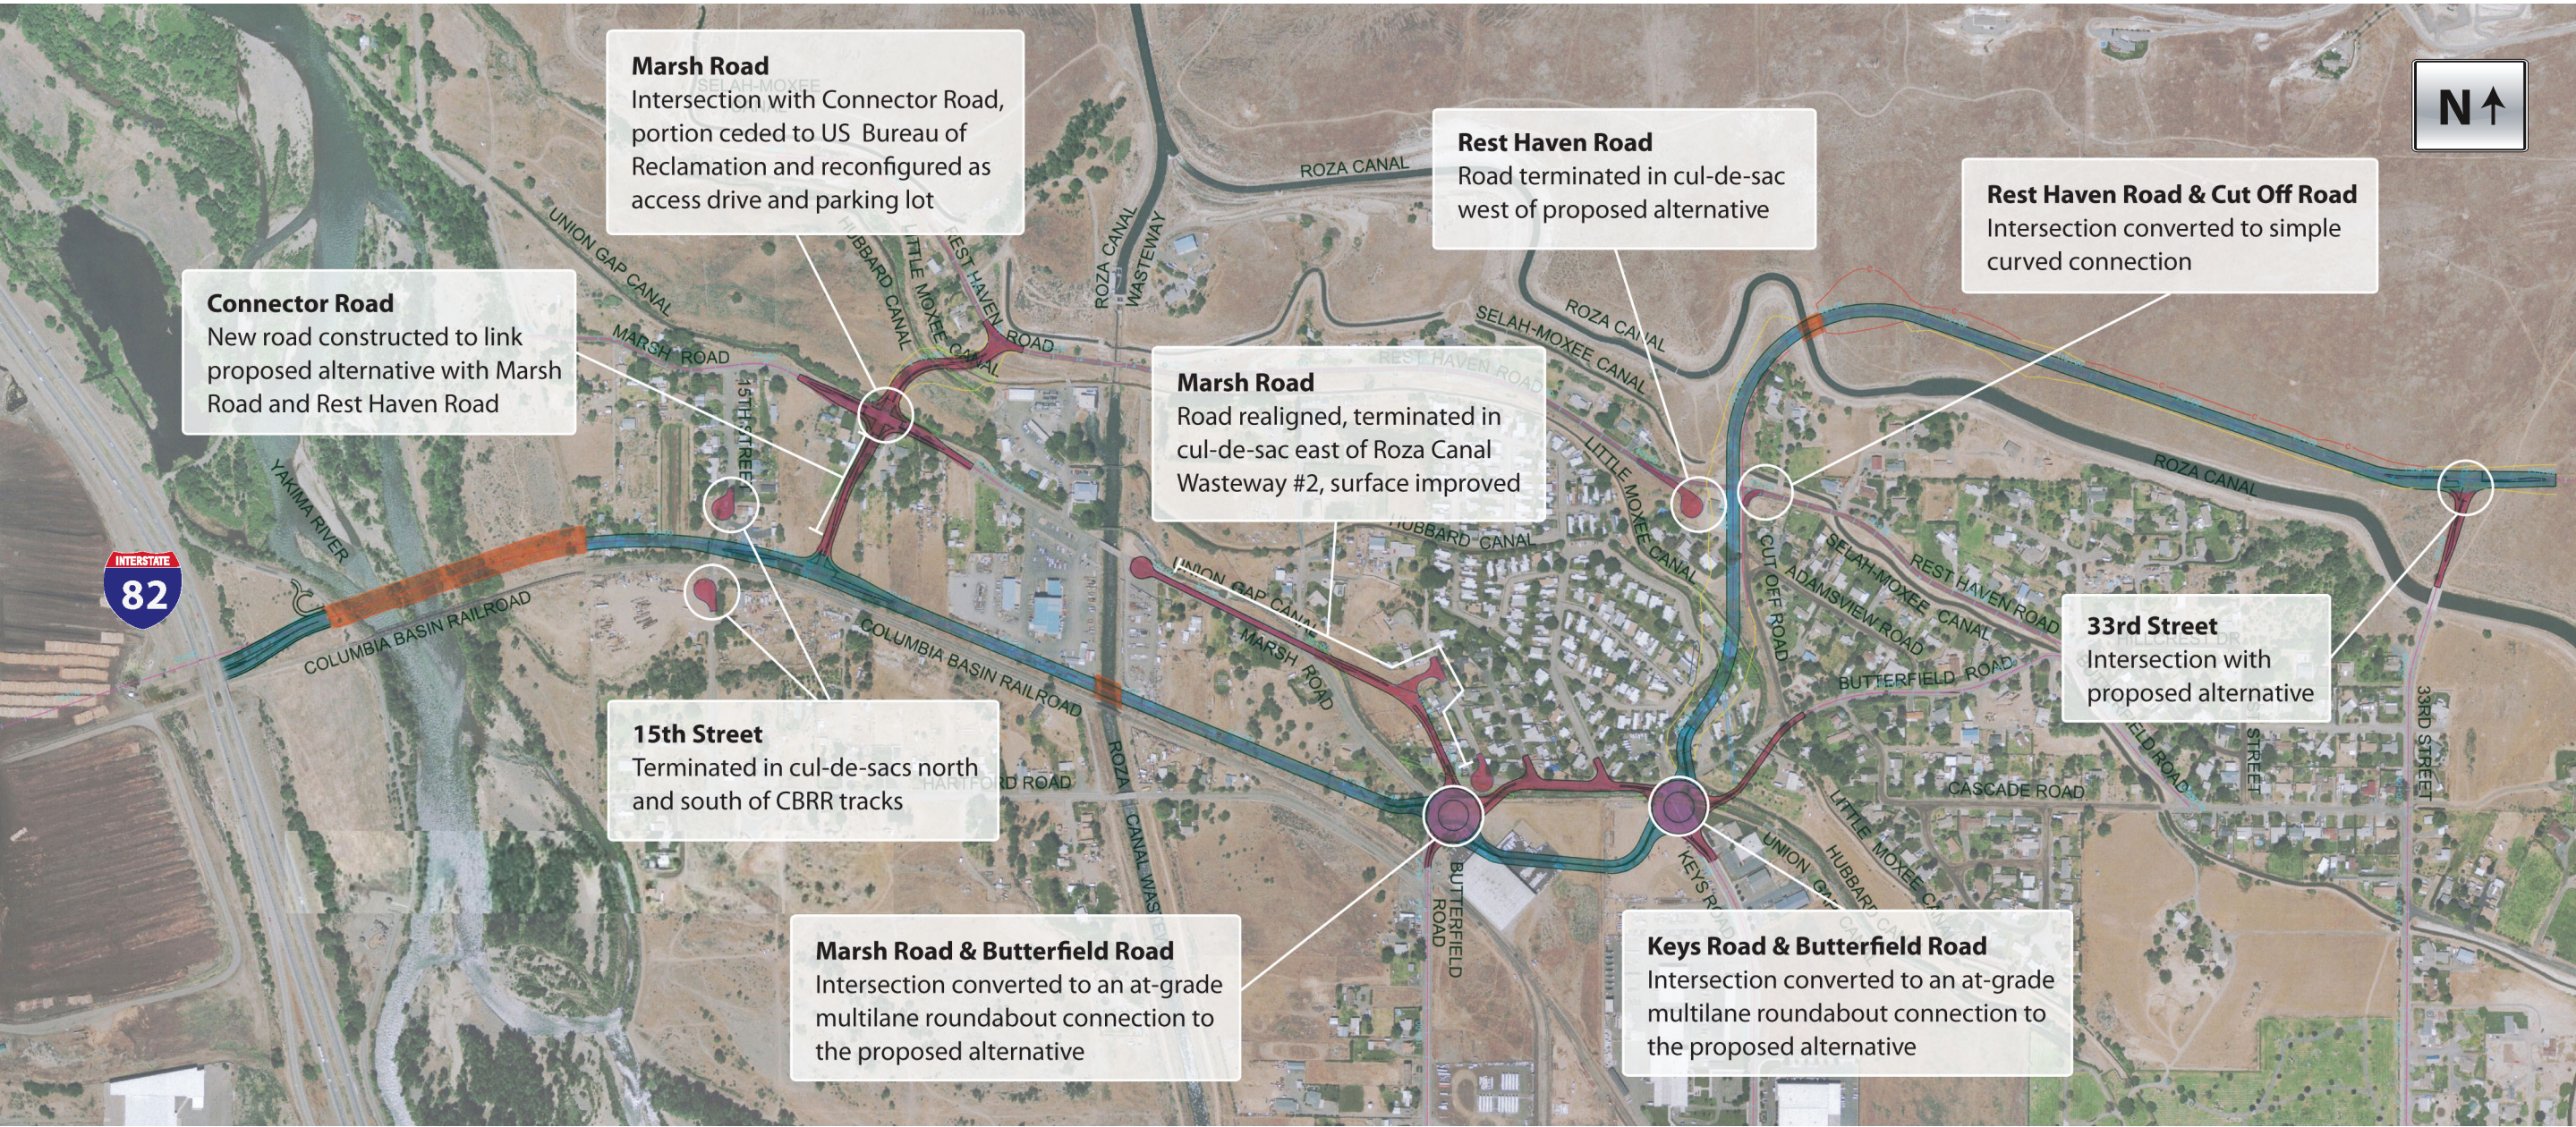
Alignment Alternative 4 – Lowlands – Suggested Improvement to Existing Roadway Network
